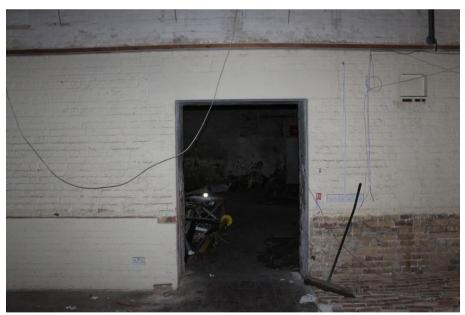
Inserted modern features in western end of Structure 6's ground-floor. Stairway leading down from first-floor to external door visible in centre. Staircase up to first-floor of Structure 5 visible to right. Photograph taken facing west.
